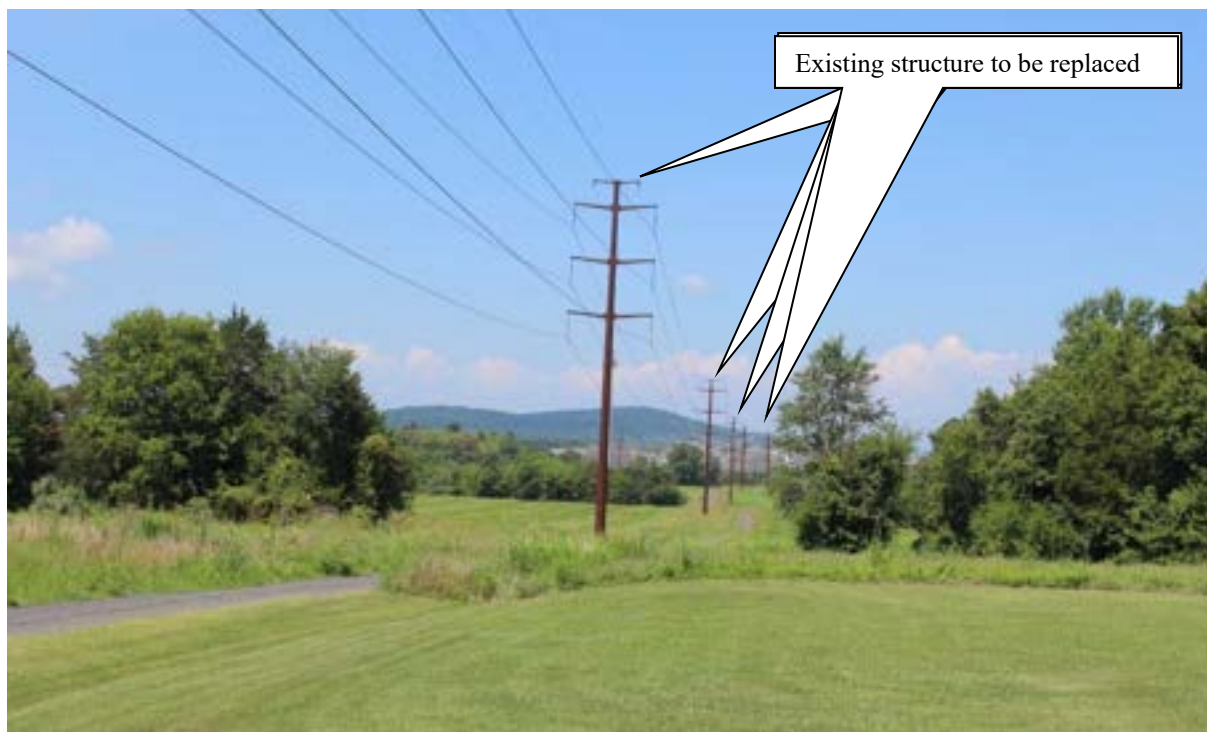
Photo location 11- View from rear of Rose Hill house (multiple existing project structures visible), facing west.
